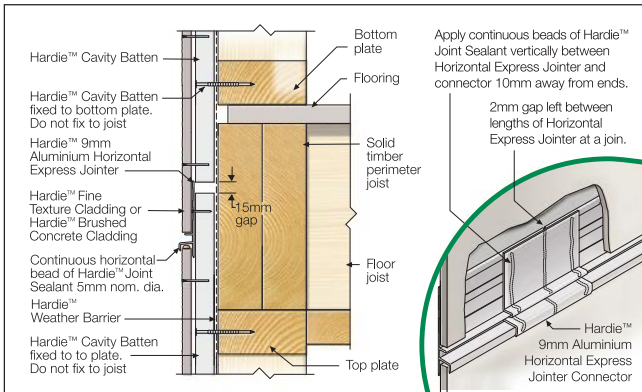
FLOOR LEVEL JUNCTION HORIZONTAL EXPRESS JOISTER
